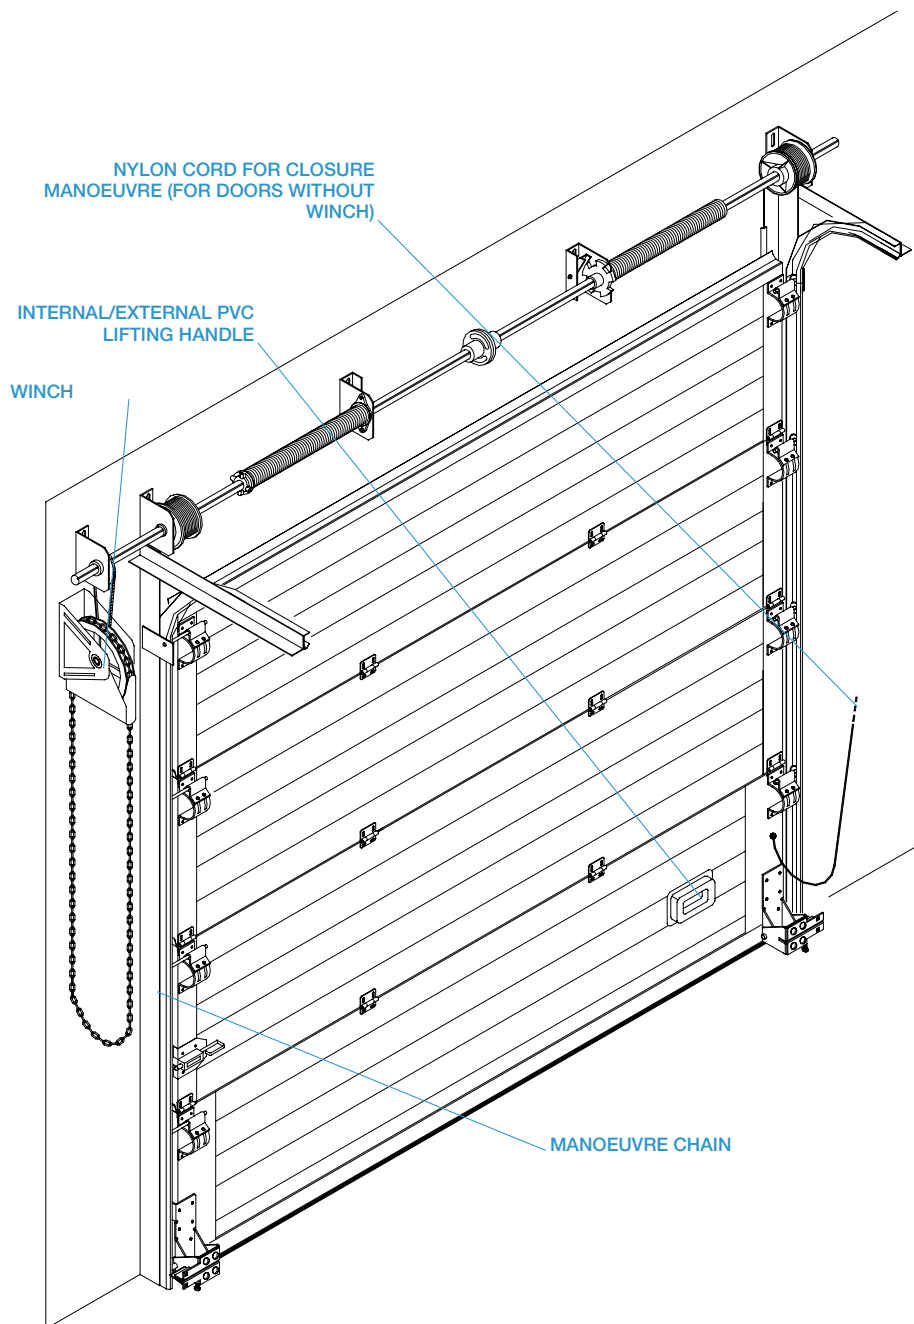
FINAL LAYOUT OF THE ASSEMBLED DOOR
